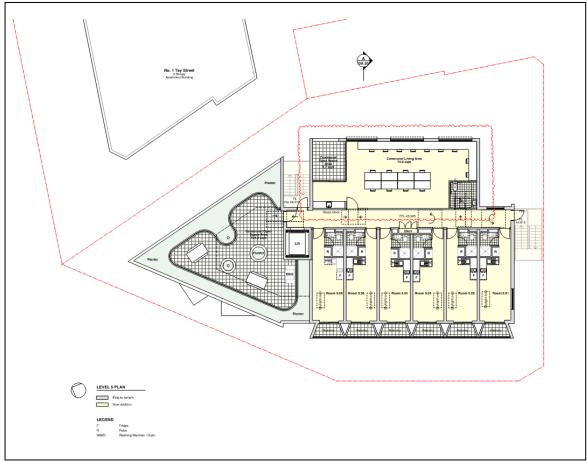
Proposed Level 5 Plan for 2 Anzac Parade, Kensington (Source: Applicant)
